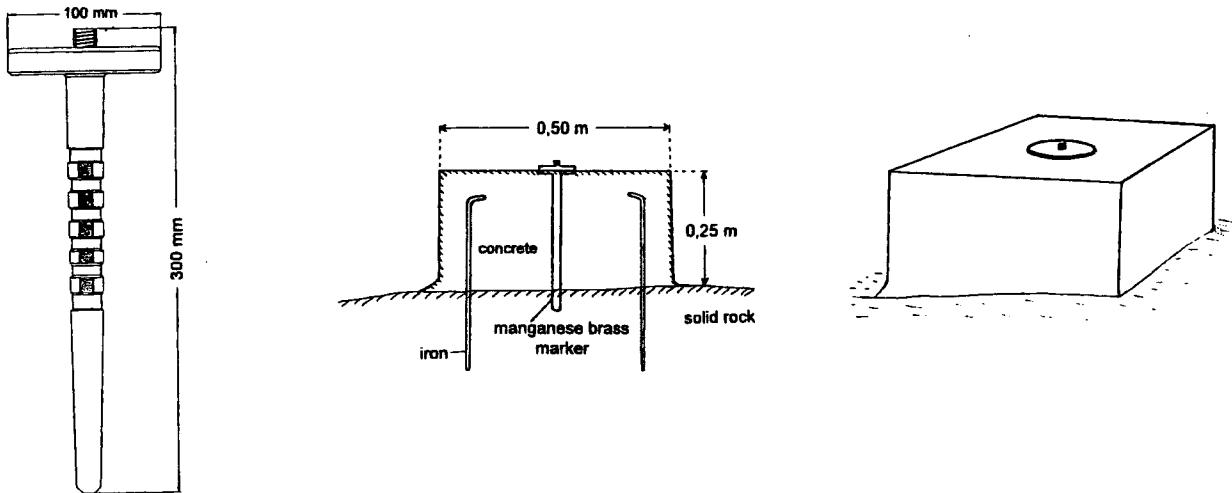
The marker constructed for Stamnett stations, and a typical 3D station
